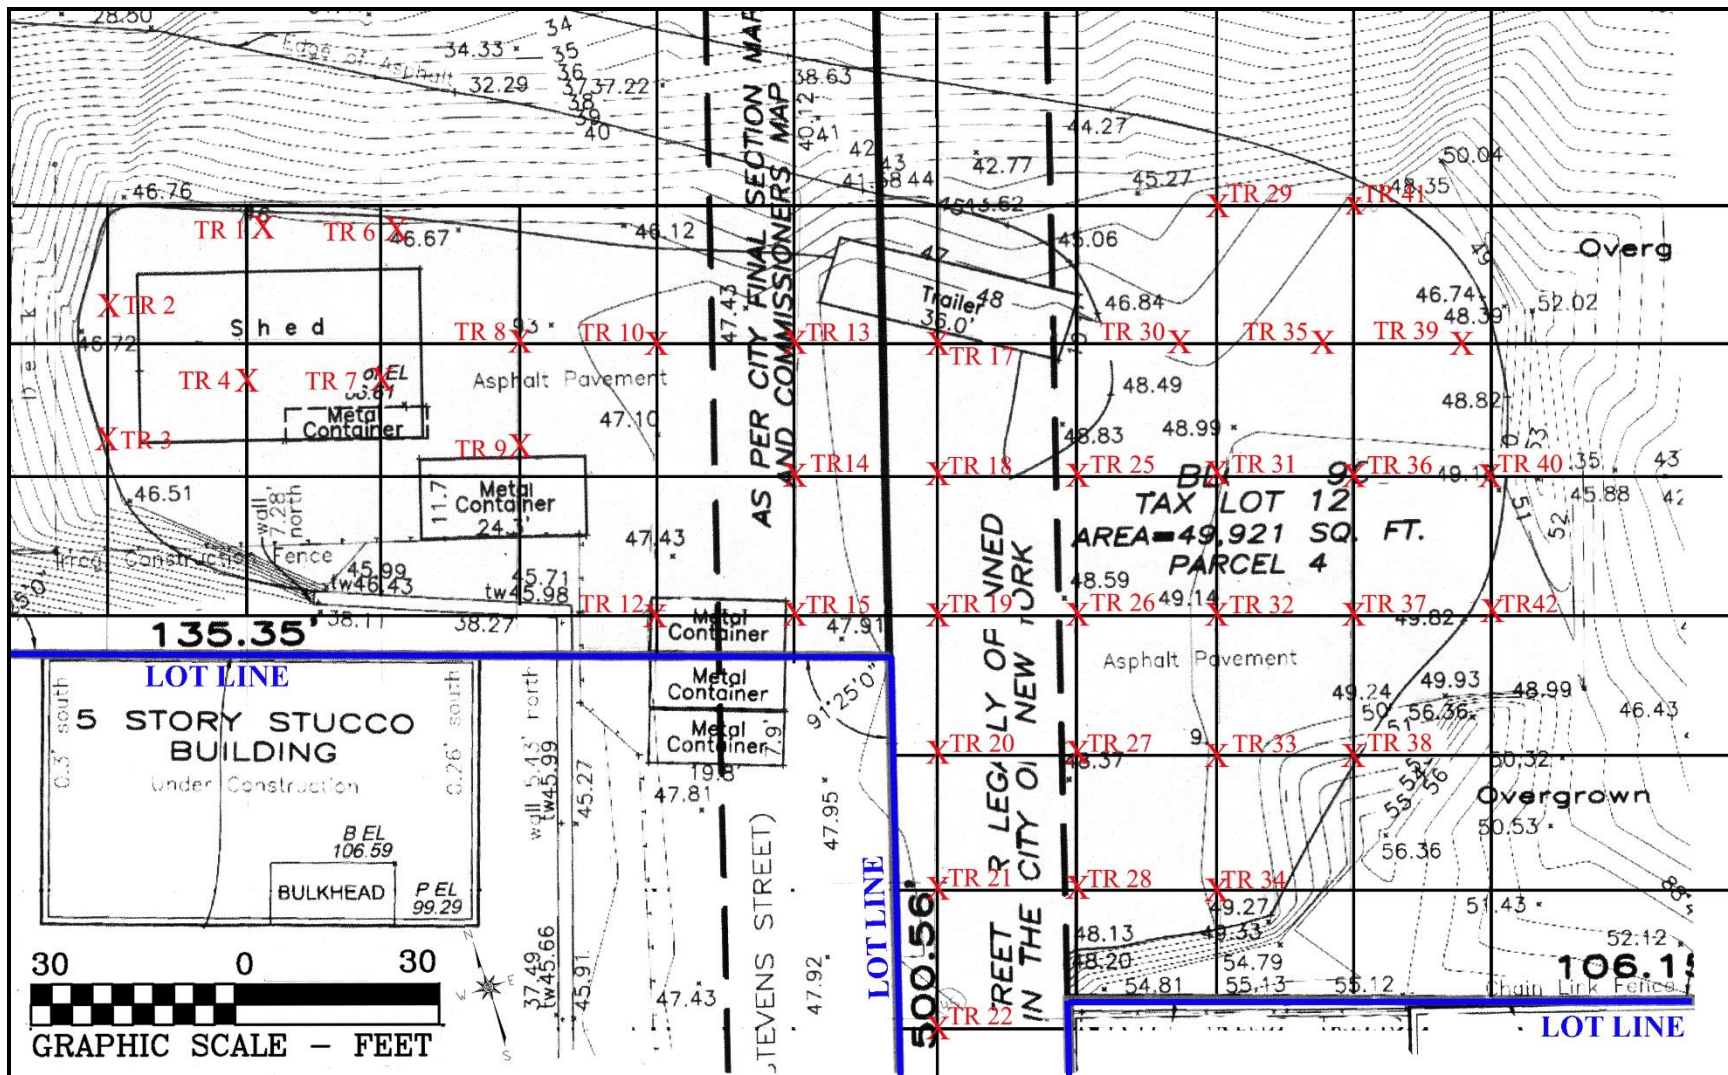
AREA H – MP detail showing Area H with test trench locations added.
